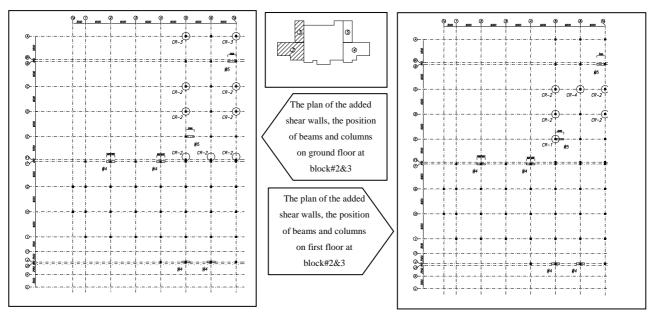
Locataion plan of Retrofitting shear wall, column , beams at block 2,3
